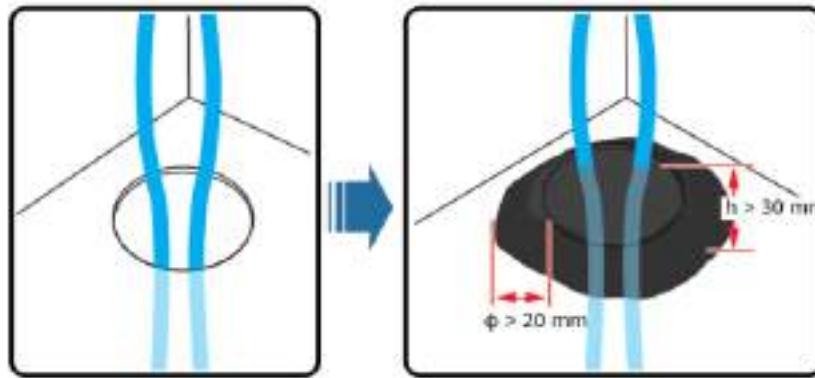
Cable Entry Hole Sealing Standard Diagram
